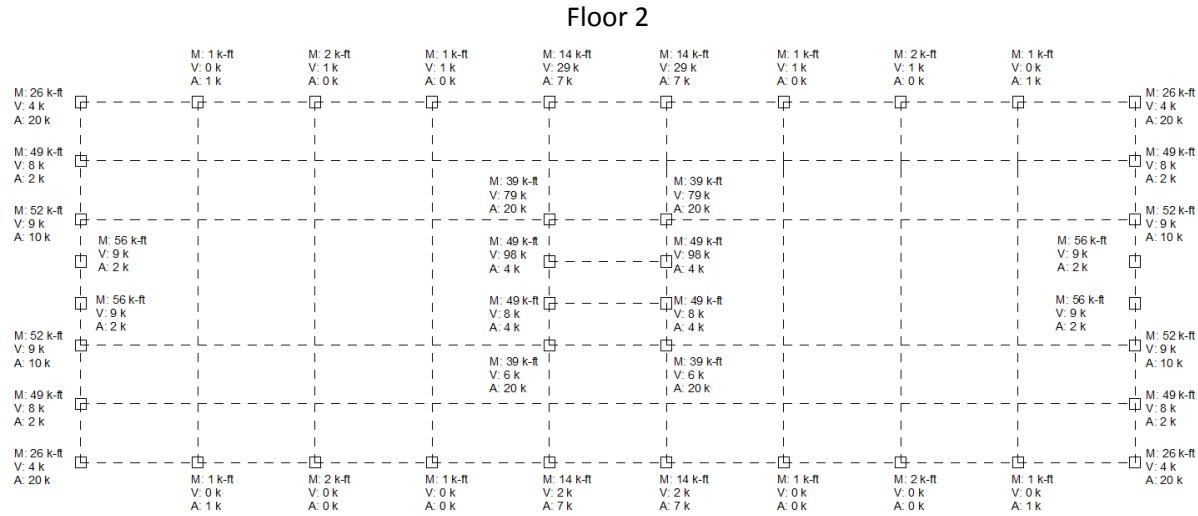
Maximum forces in the second floor columns due to tsunami base shear
